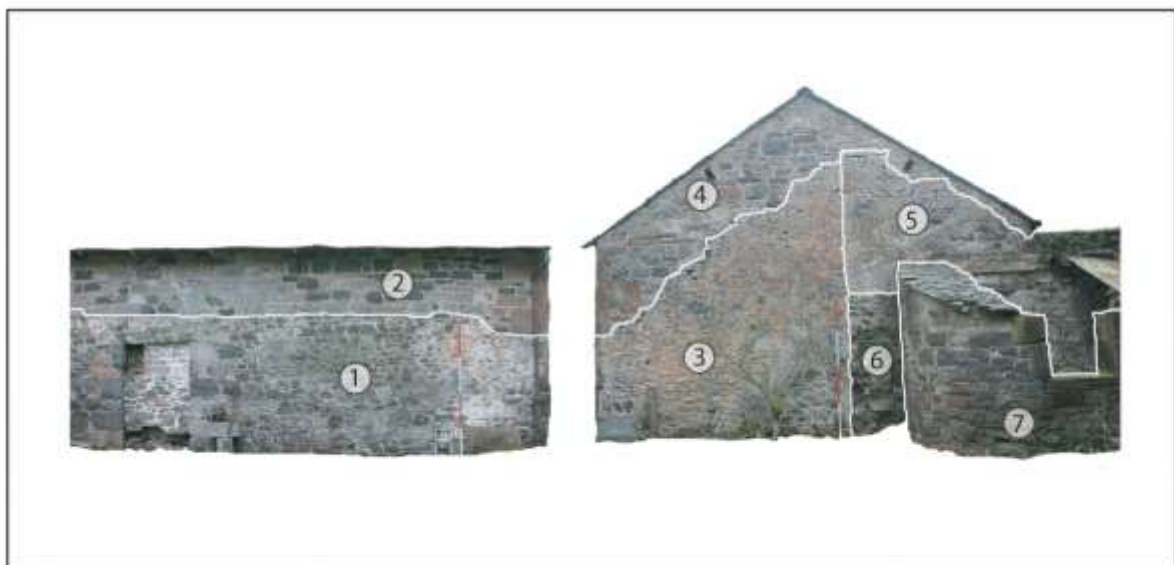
North wing wall sections (north wall to left and west gable wall to right).
